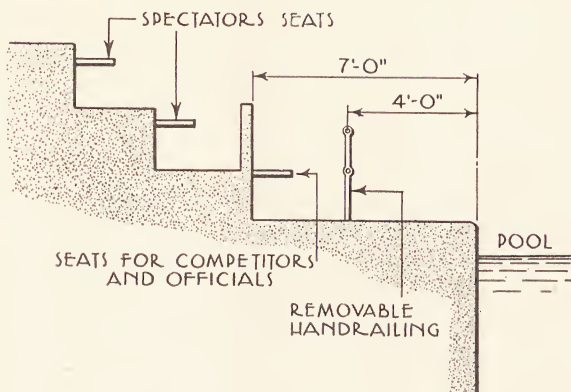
SECTION THROUGH SIDE OF LARGE POOL
